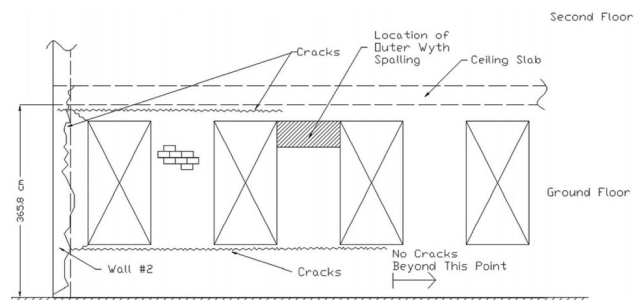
Pattern of cracks developed on the ground floor load bearing wall (Wall #3) (Zapata J. B. and Weggel C. D., 2008)
